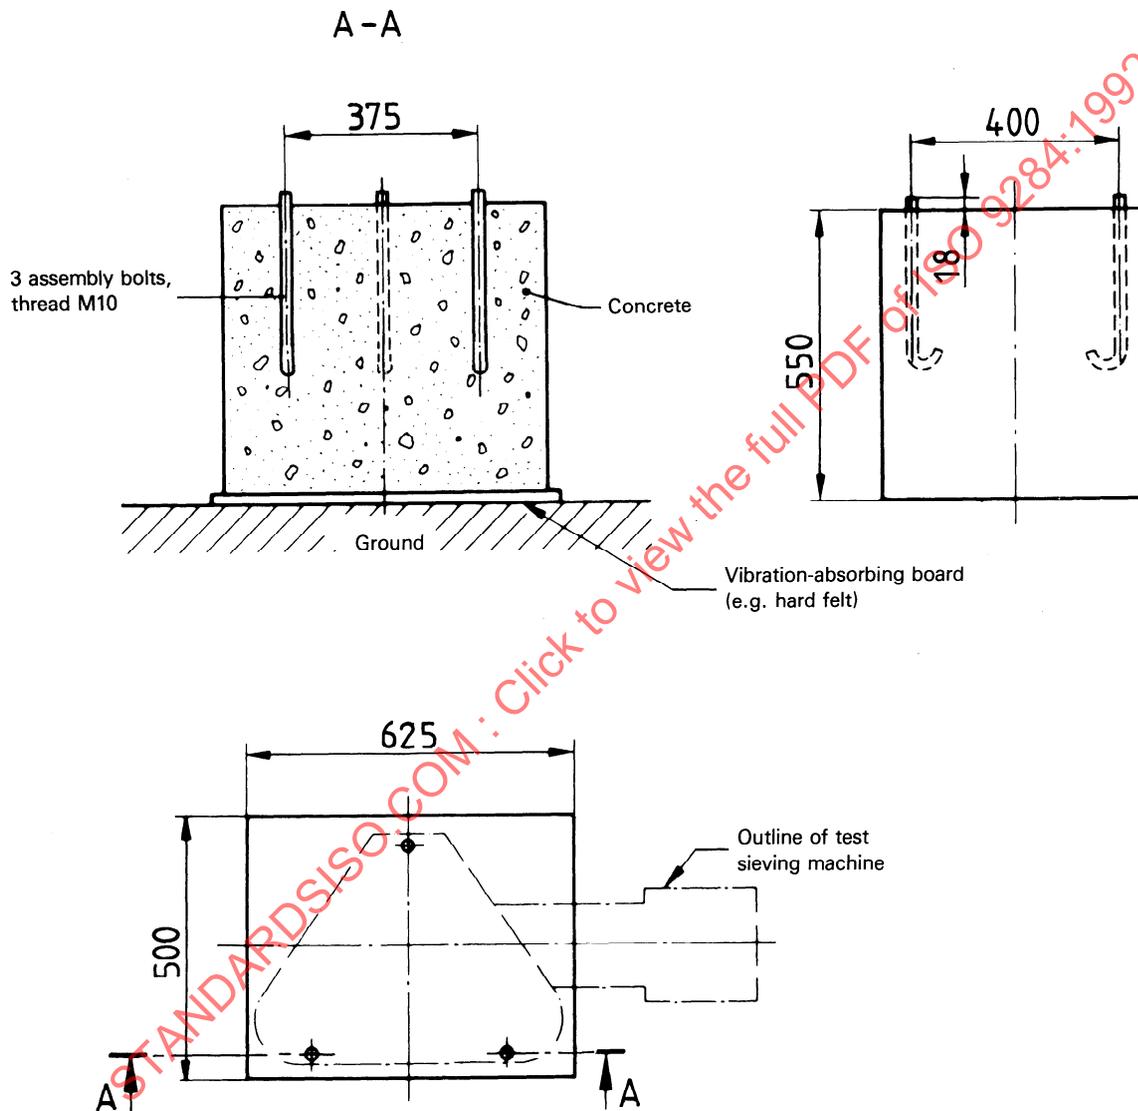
Base-plate and mating dimensions for the assembly of test-sieving machines, type A
